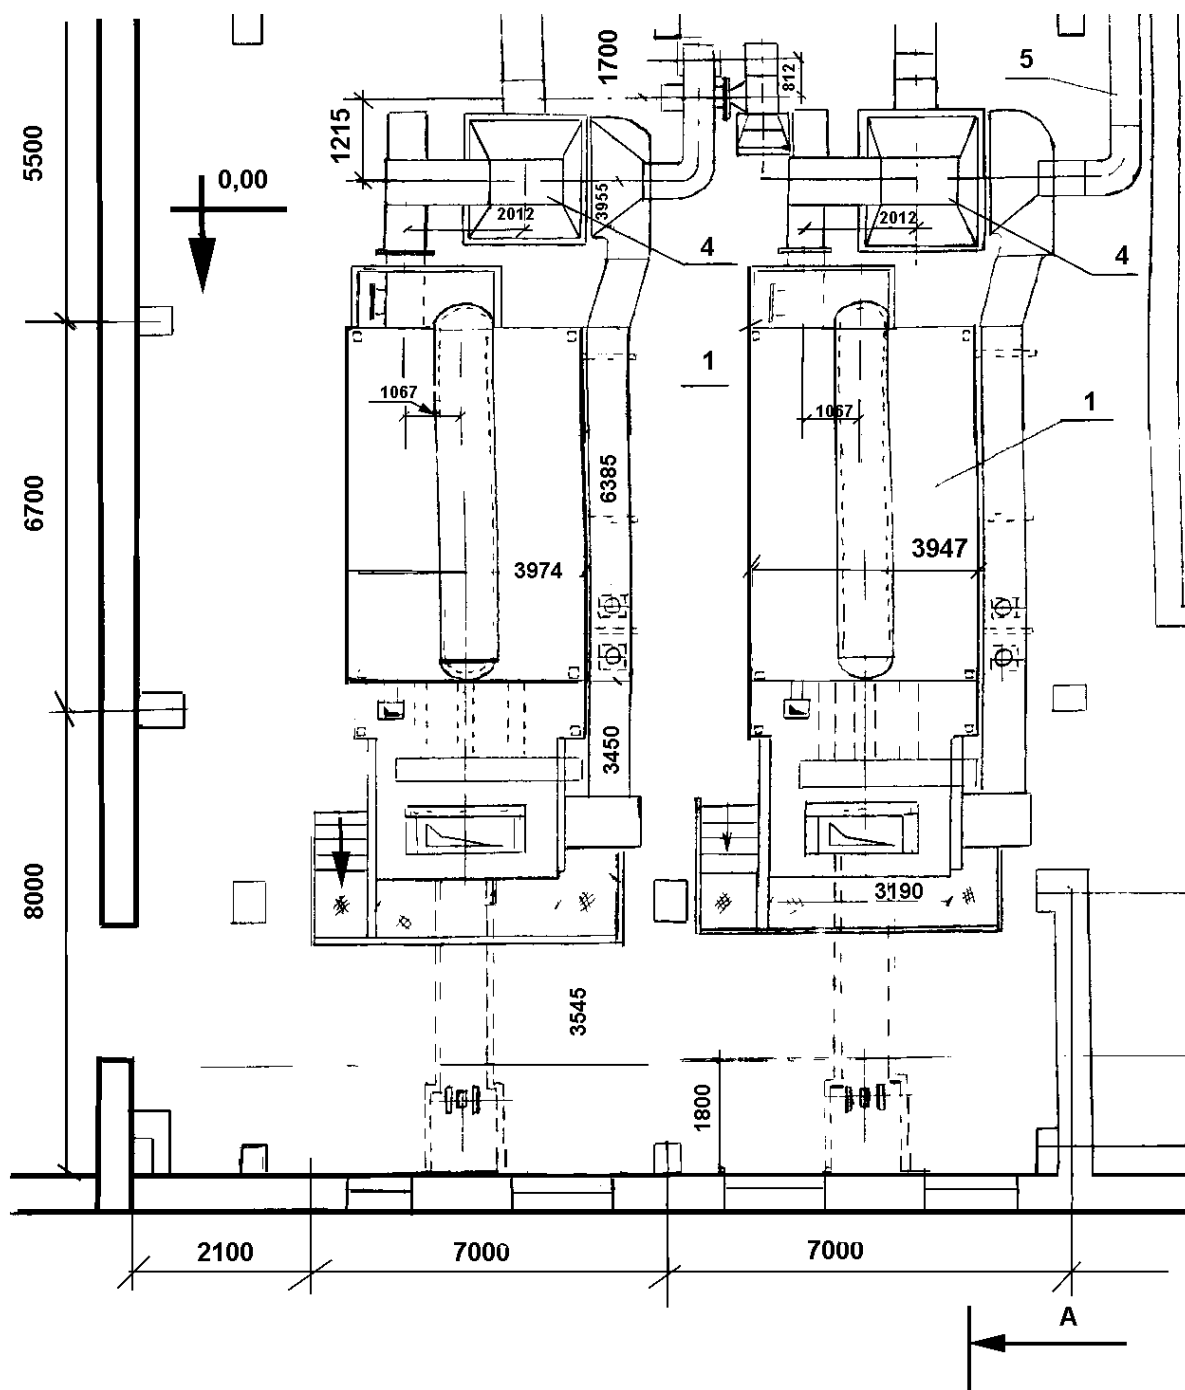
Boiler house at Rechitza Drew Sawmill. Air view on wood fired boilers
